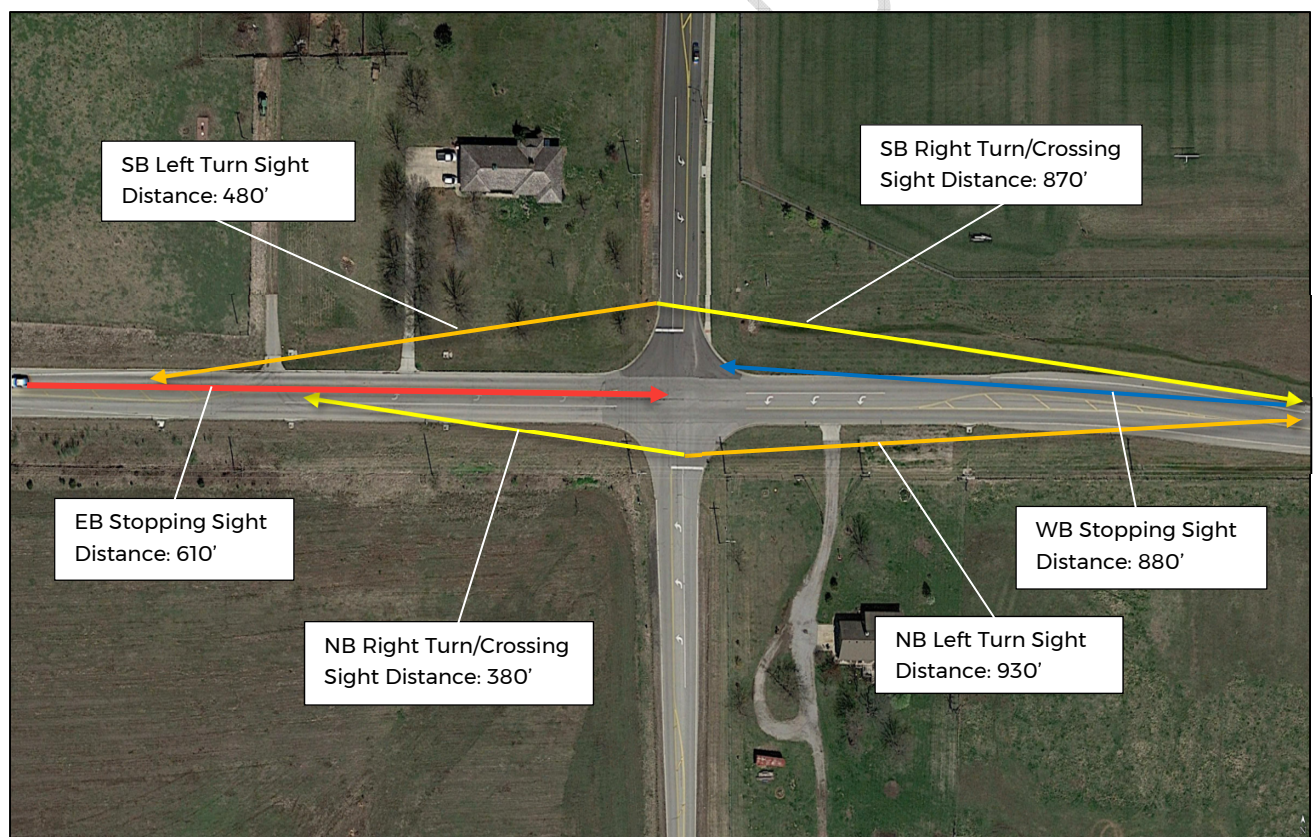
Existing Sight Distance at 199th Street & Ridgeview Road
